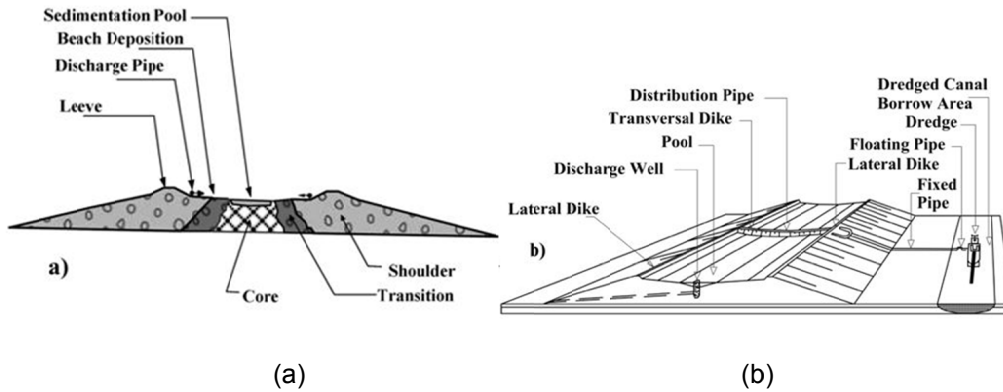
(a) Typical section of a hydraulic fill dam; (b) Hydraulic fill and dredge perspective (Valenzuela 2015)
